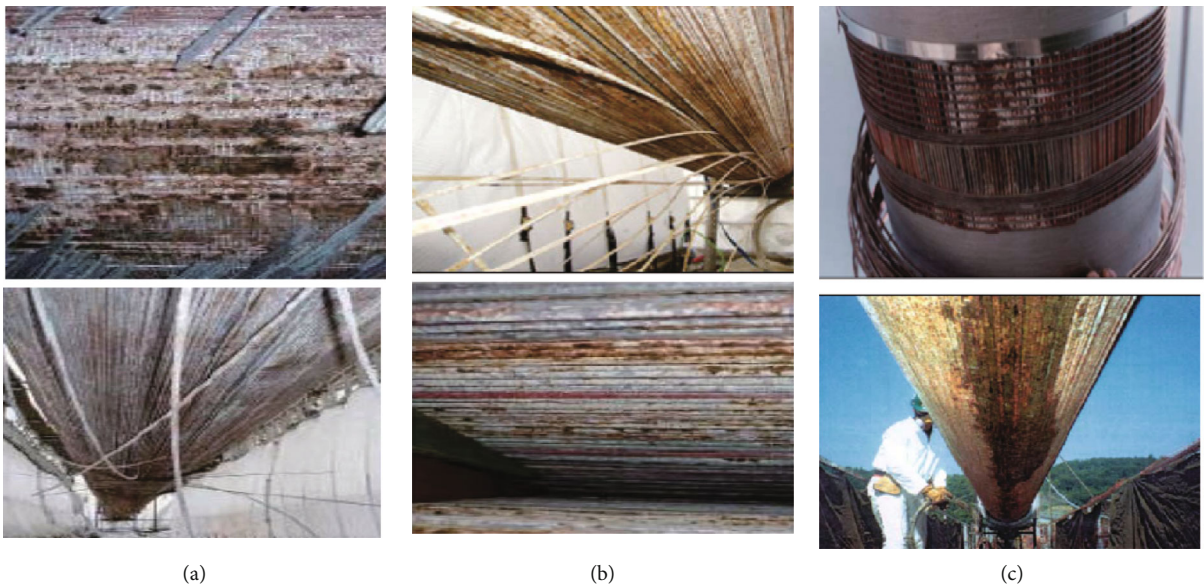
Corrosion of main cables on suspension bridge: (a) the Golden Gate Bridge, (b) Forth Road Bridge, and (c) Japan Dashima Bridge.
